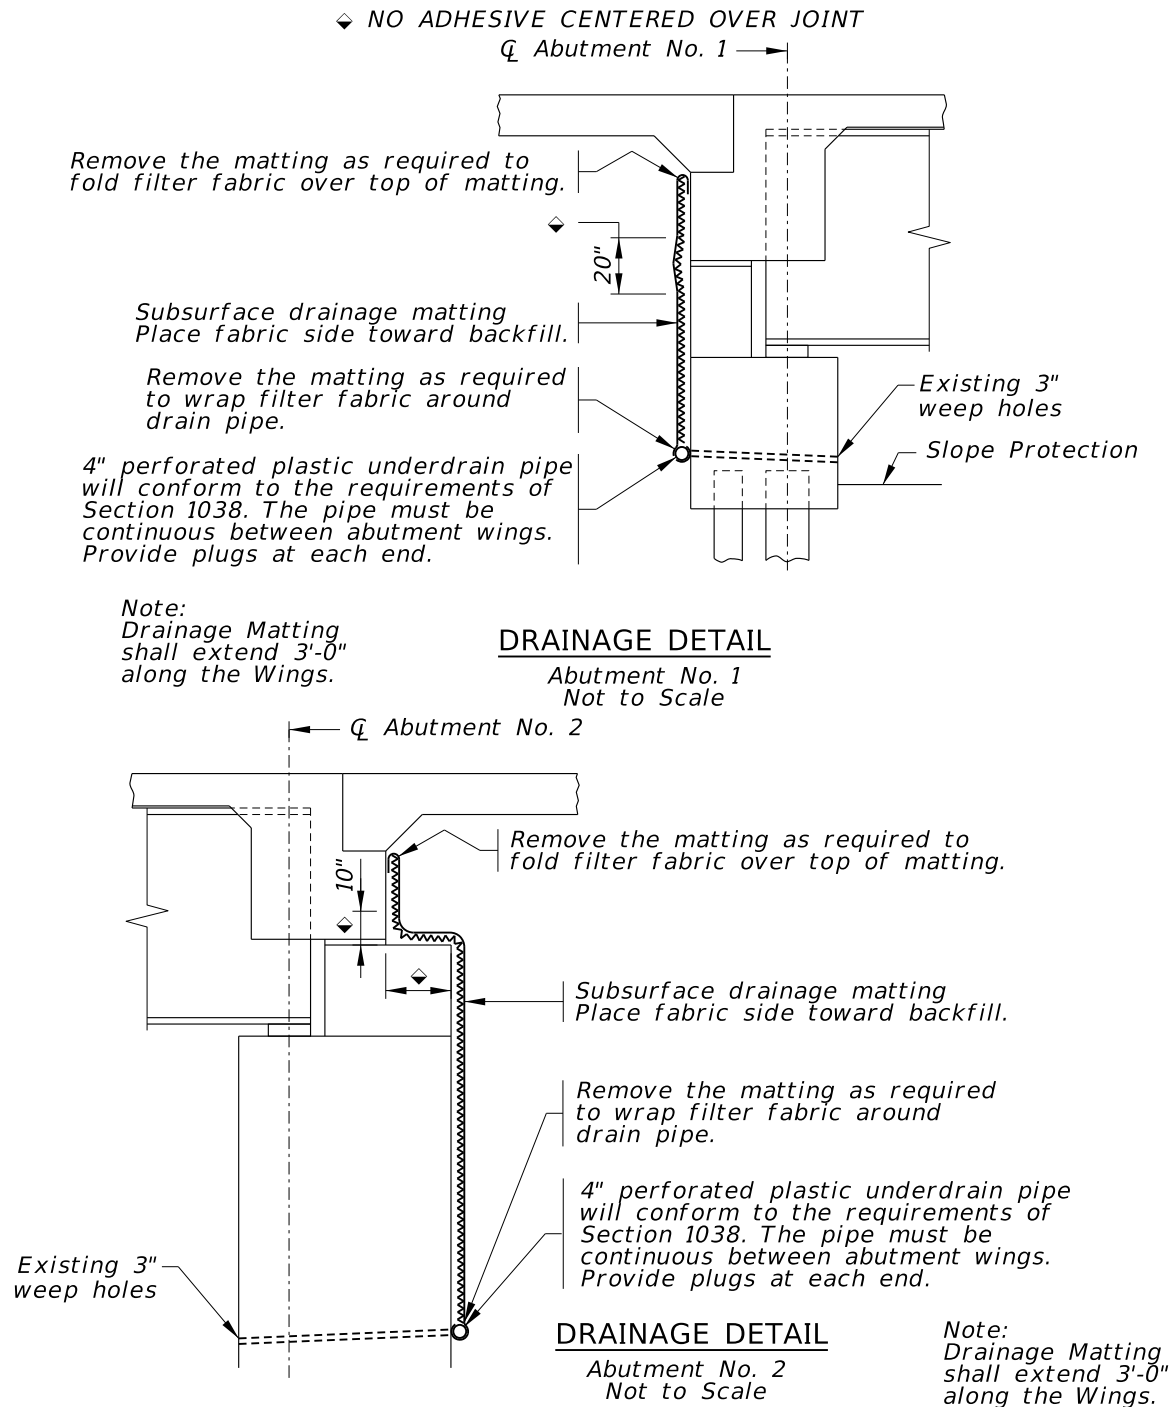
Abutment Drainage Details with Drainage Daylighting
